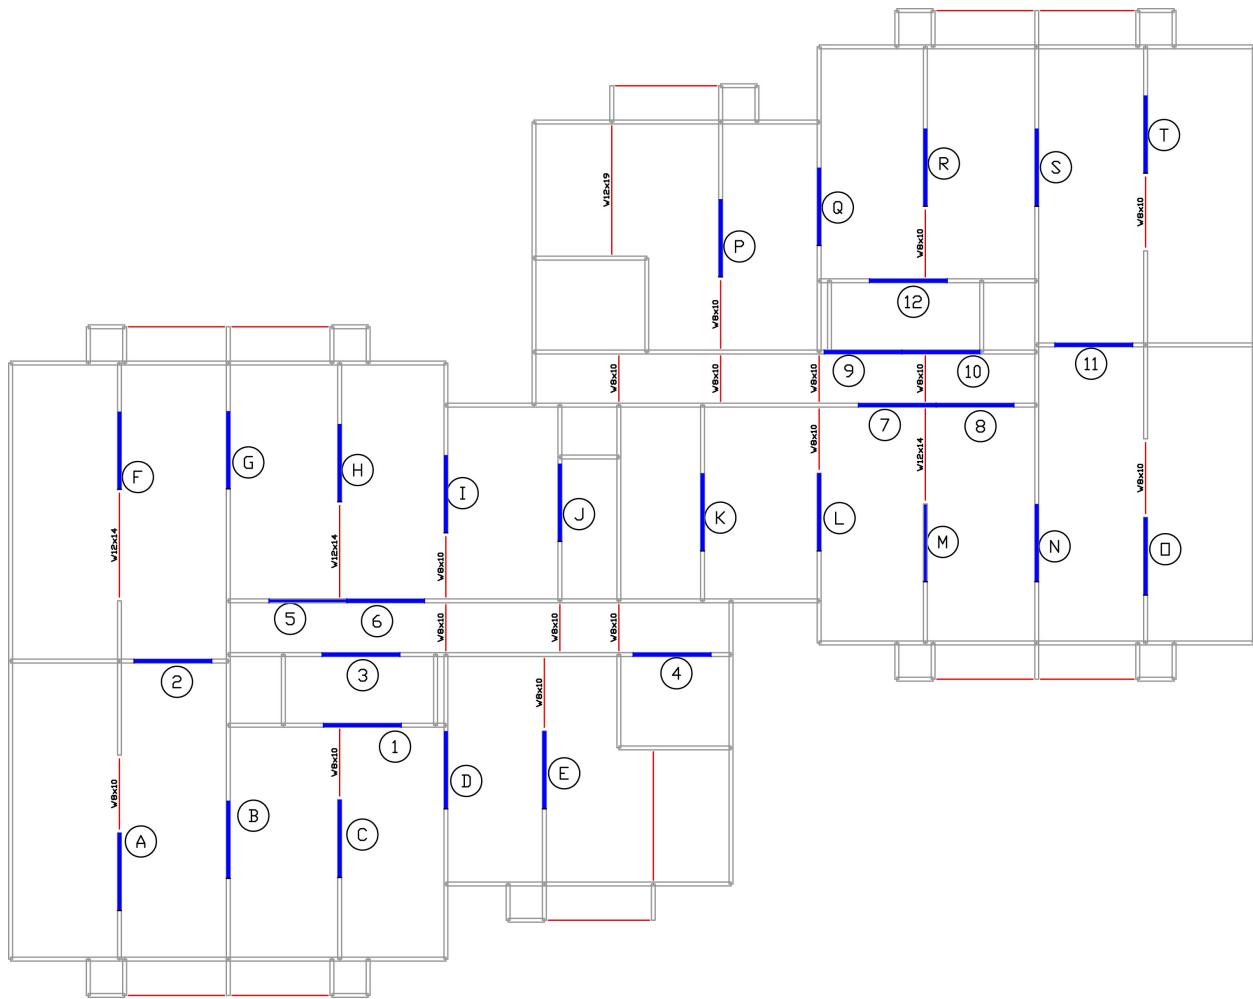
Shear wall layout of redesigned structural system (Numbered and Lettered blue walls indicate shear walls)
